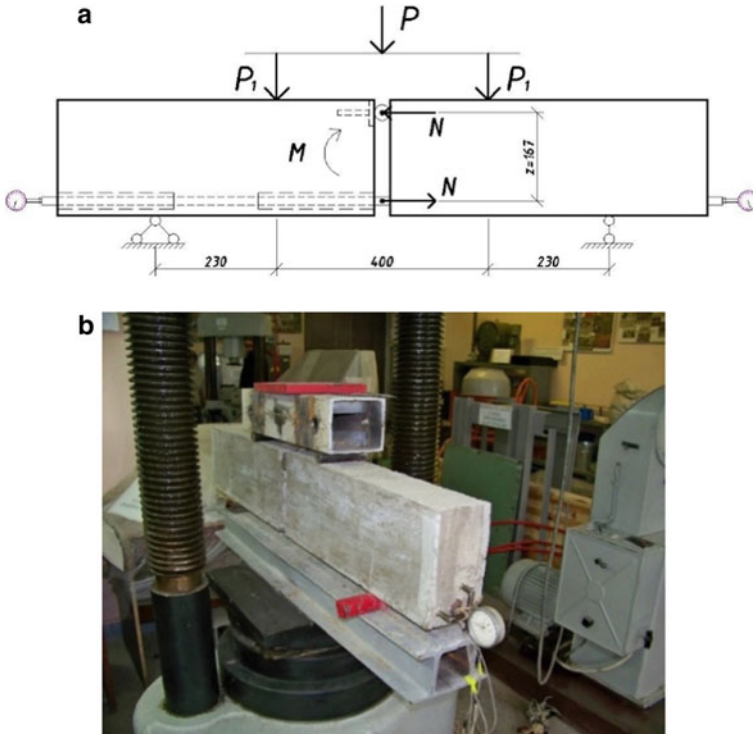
a Design scheme for concrete beams. b General view for concrete beams
